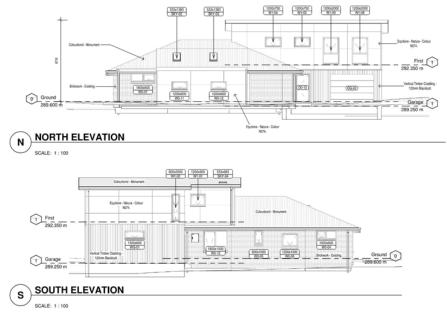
Excerpt from submitted proposed north and south elevation plans (Source: Formation Design & Drafting).
